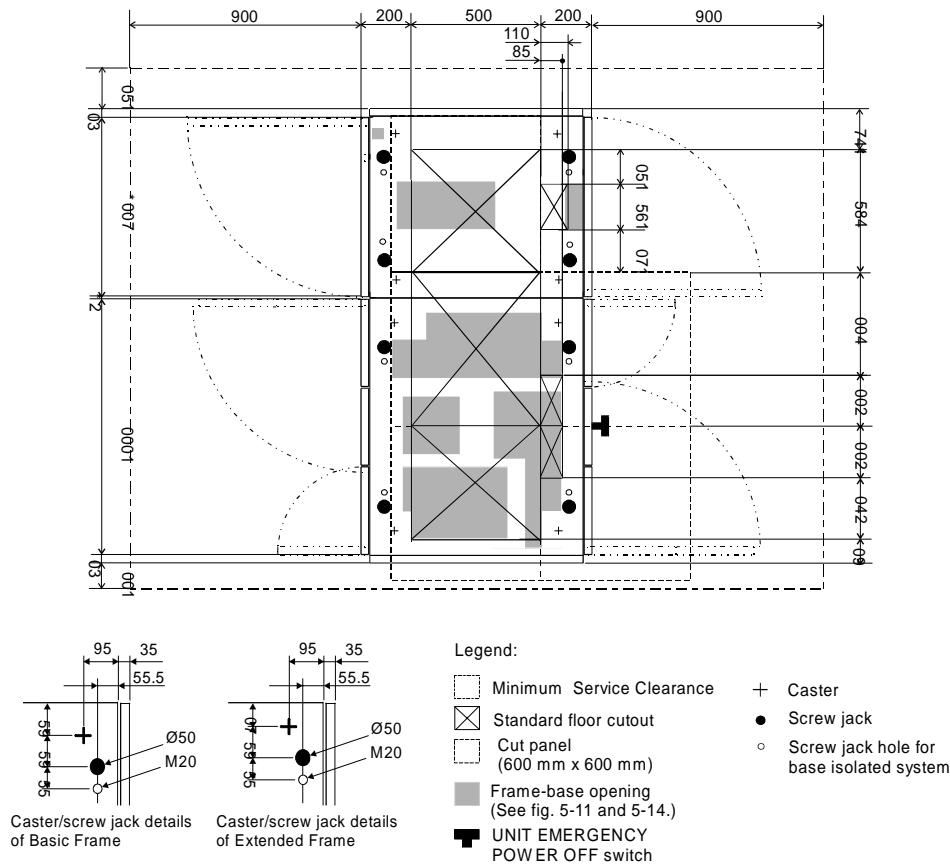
Processor Unit Floor Plan, F-7C Base—Basic and Extended Frames
